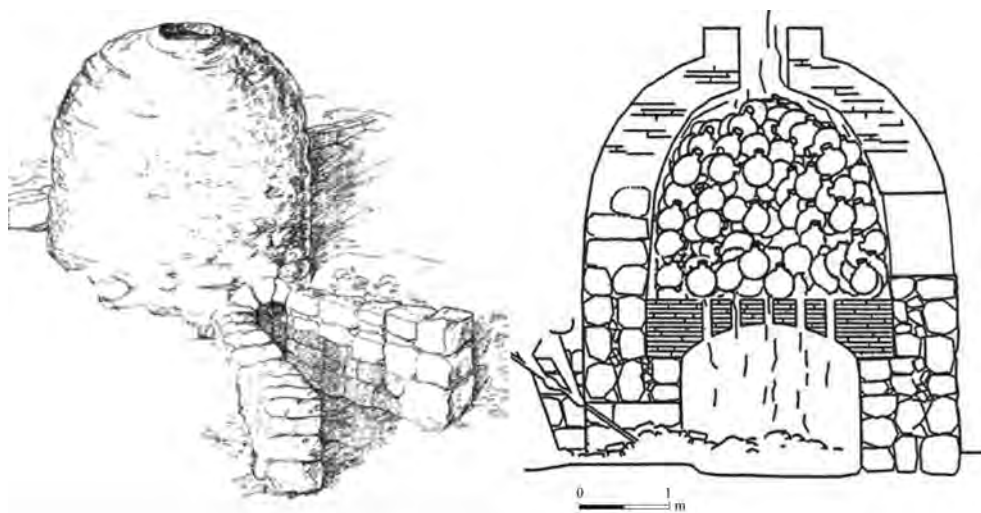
Isometric reconstruction and schematic section of a kiln (drawn by T. Meltsen).
